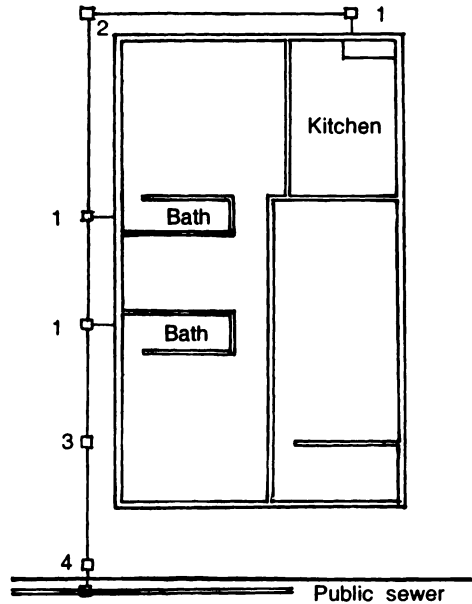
Layout of house drains and inspection chambers for a residential building: 1. Inspection chambers at pipe junctions, 2. Inspection chamber at corner, 3. Inspection chamber at intervals, 4. Inspection chamber at end of property discharging into municipal sewer.
